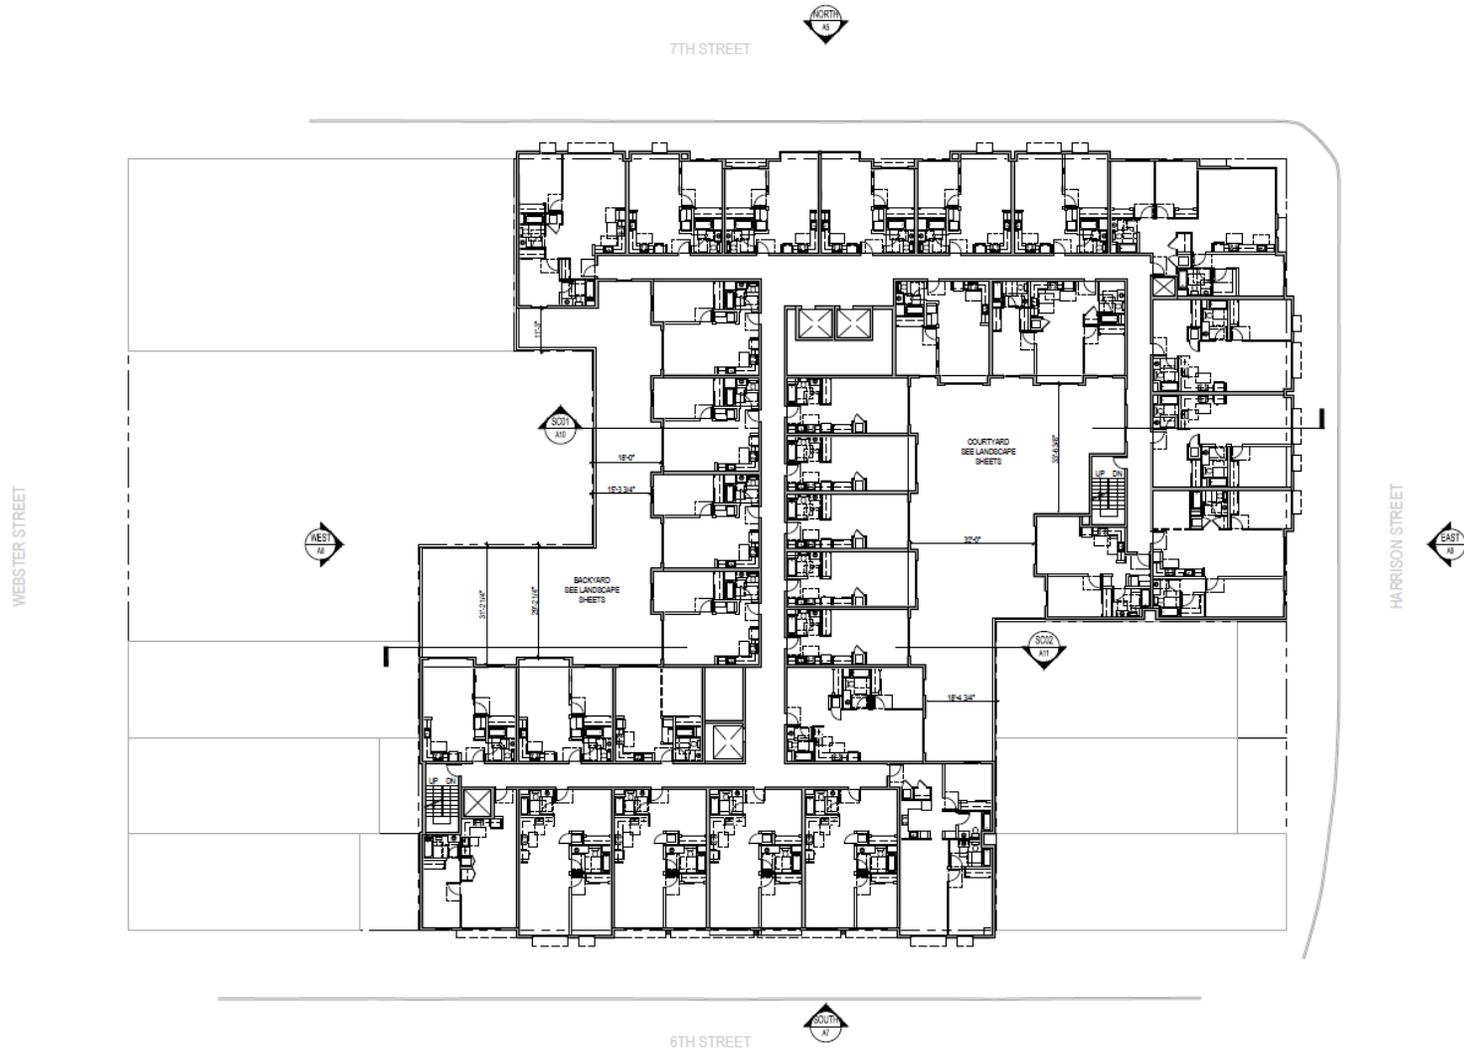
Site Plan – Typical Upper Floor (2nd – 5th)
